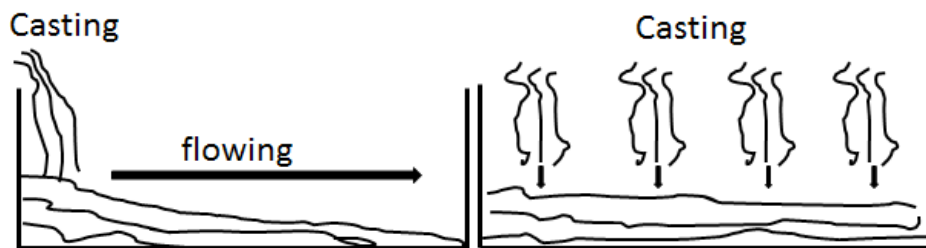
Employed casting methods: (a) cast at one side of the mould with flowing process (optimized casting); (b) cast randomly without flowing process (non-optimized casting)
